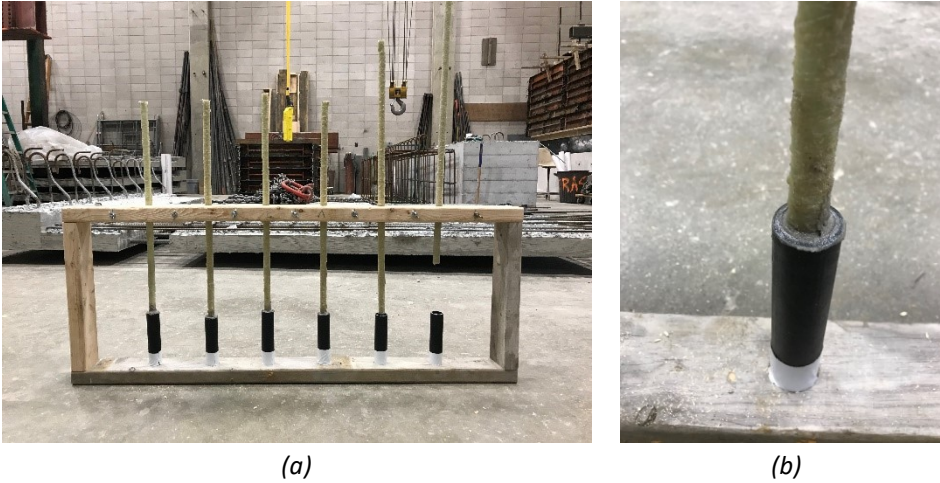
Anchorage system developed for grip installation on GFRP rebar
